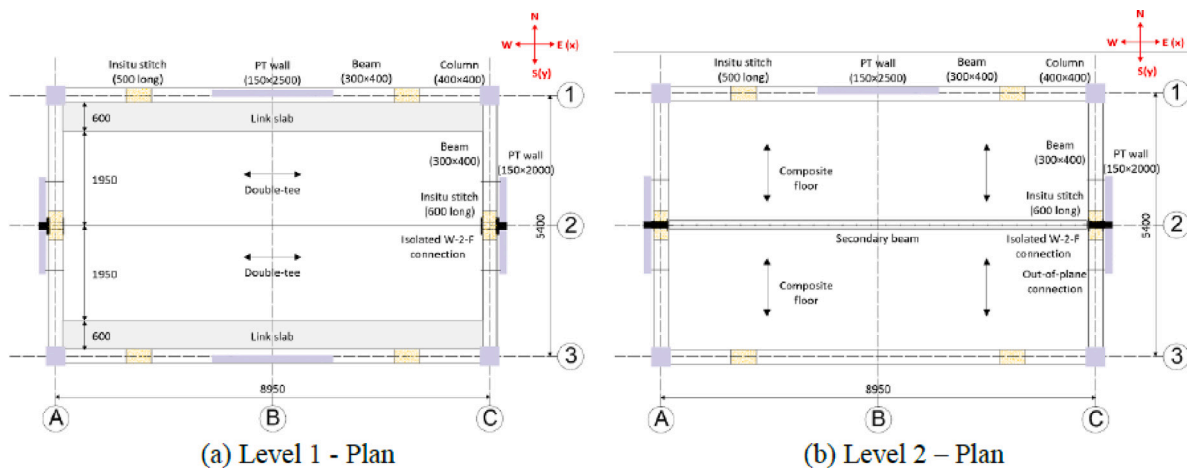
Plan view of each floor for the two-story concrete wall test building; adopted from Lu et al. 2021 [89].
